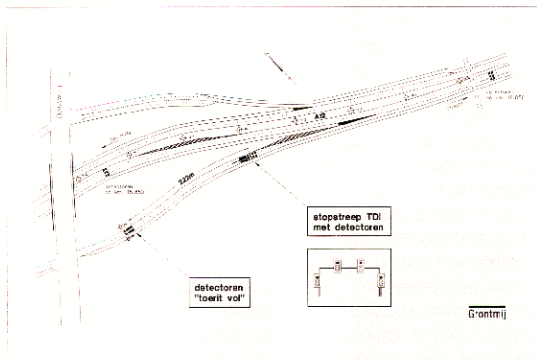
Layout of the ramp at Zoetermeer. 'TDI' = Toeritdoseerinstallatie = ramp metering installation.
